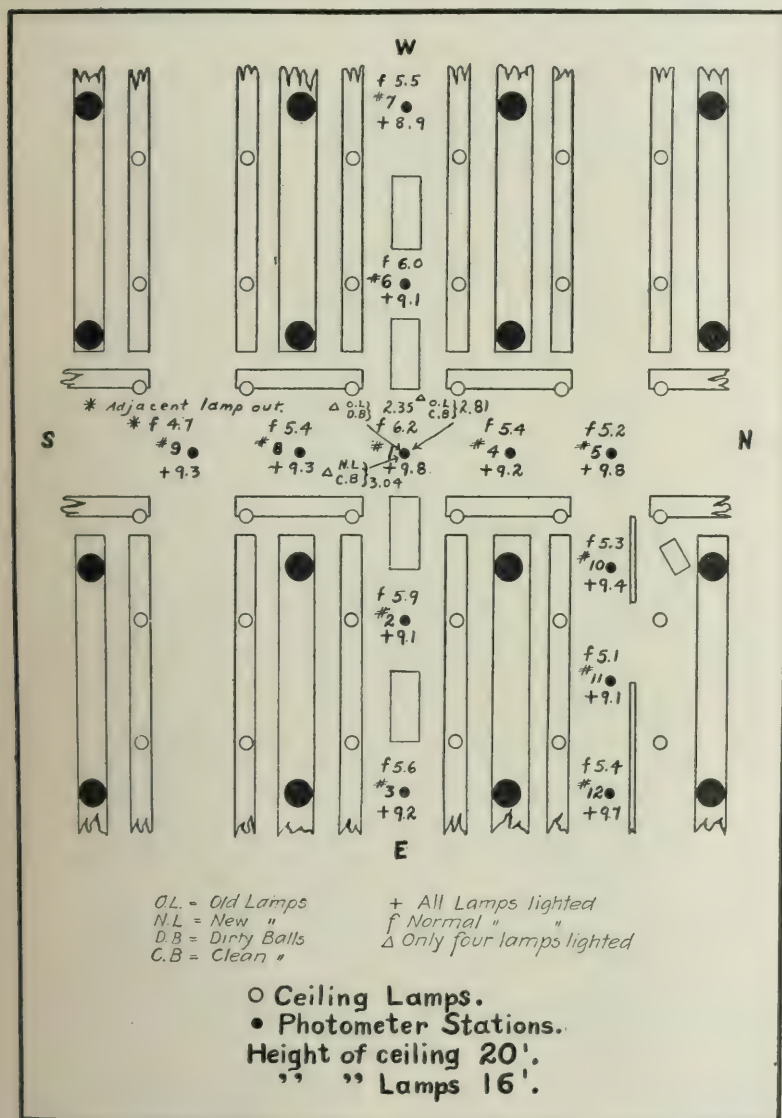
Section plan of main floor, showing location of furniture, pillars, lighting units, test stations and illumination data.
